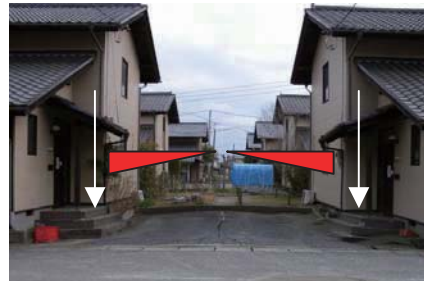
Subsidence of two houses enclosing vacant land
